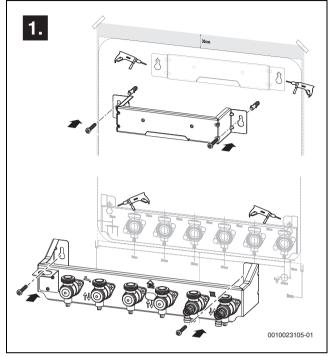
Attach template, drill holes, install wall mounting bracket and mounting plate
